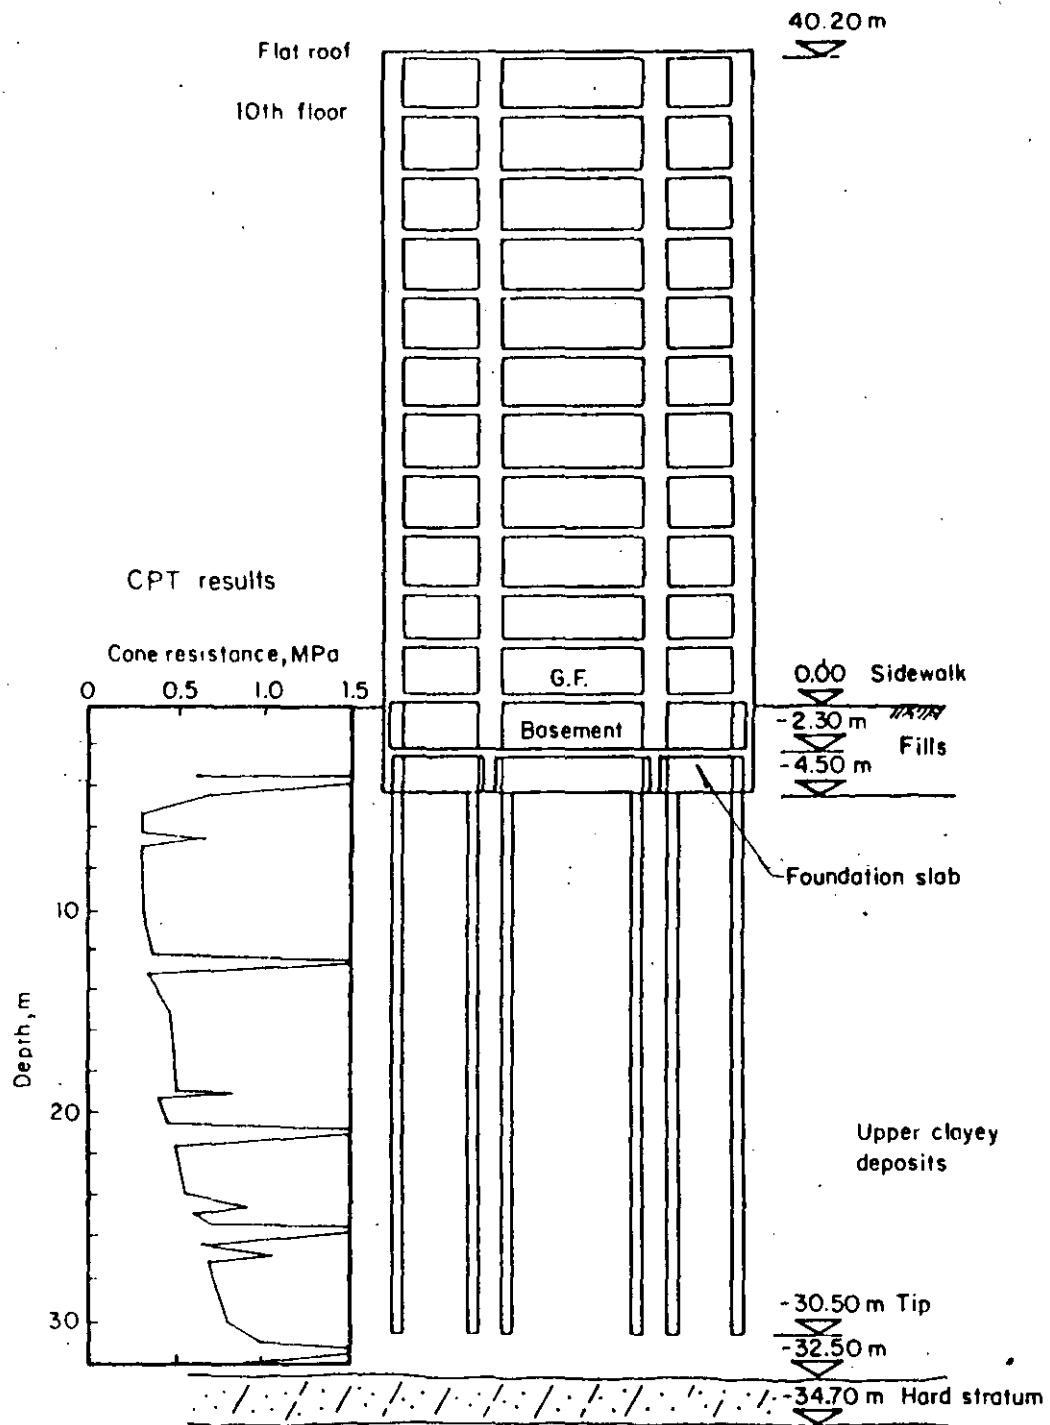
Elevation of the Building IV including foundation and geotechnical conditions.
